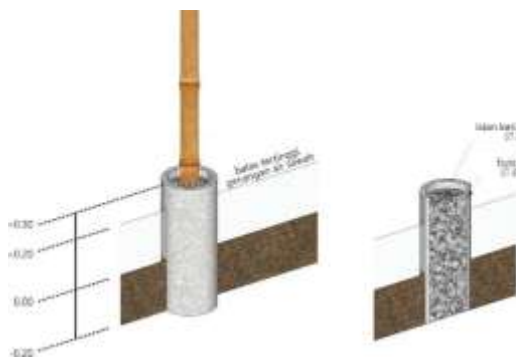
Cross-section of the hollow pedestal foundation (right).
